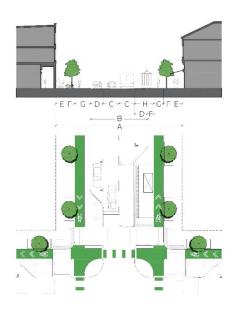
Mullan Area Master Plan - Main Street Collector Typical Section
